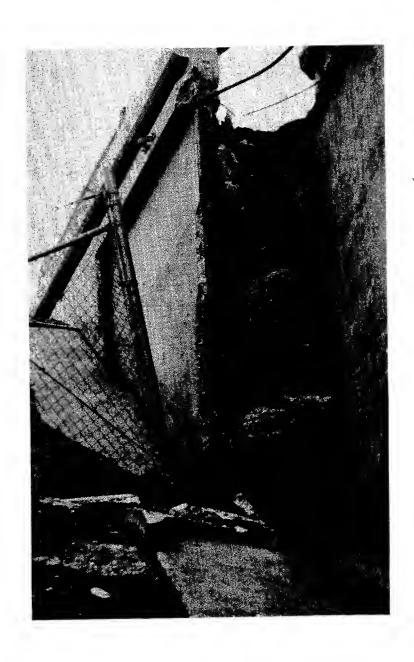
Damaged wing wall of abutment—Roxford Street Undercrossing at Foothili Freeway
